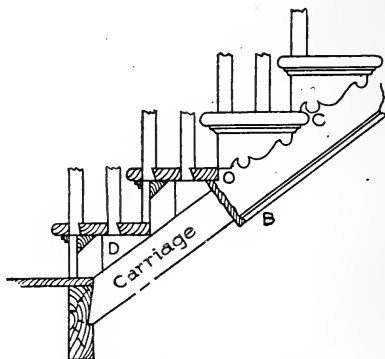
End Portion of Cut and Mitered String, with Part Removed to Show Carriage.
